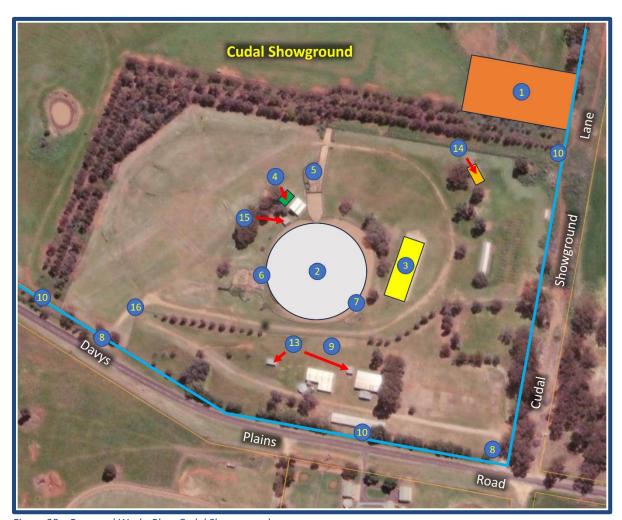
Proposed Works Plan, Cudal Showground (refer numerations 11.8)
